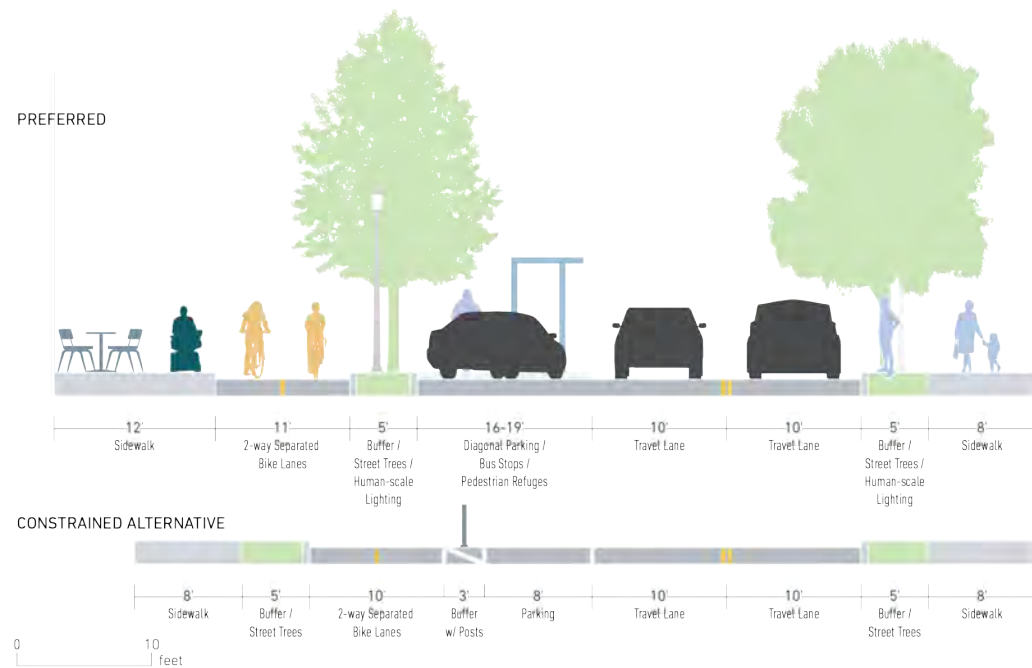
Recommended street design, and alternative street design in constrained areas, on Main Streets.
